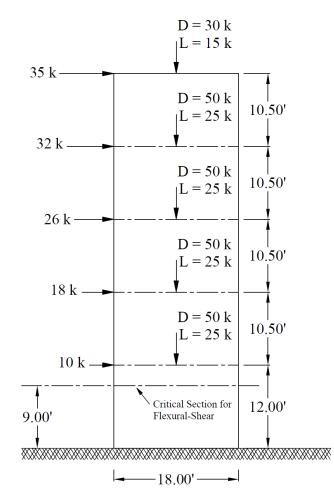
Reinforced Concrete Shear Wall Geometry and Loading
